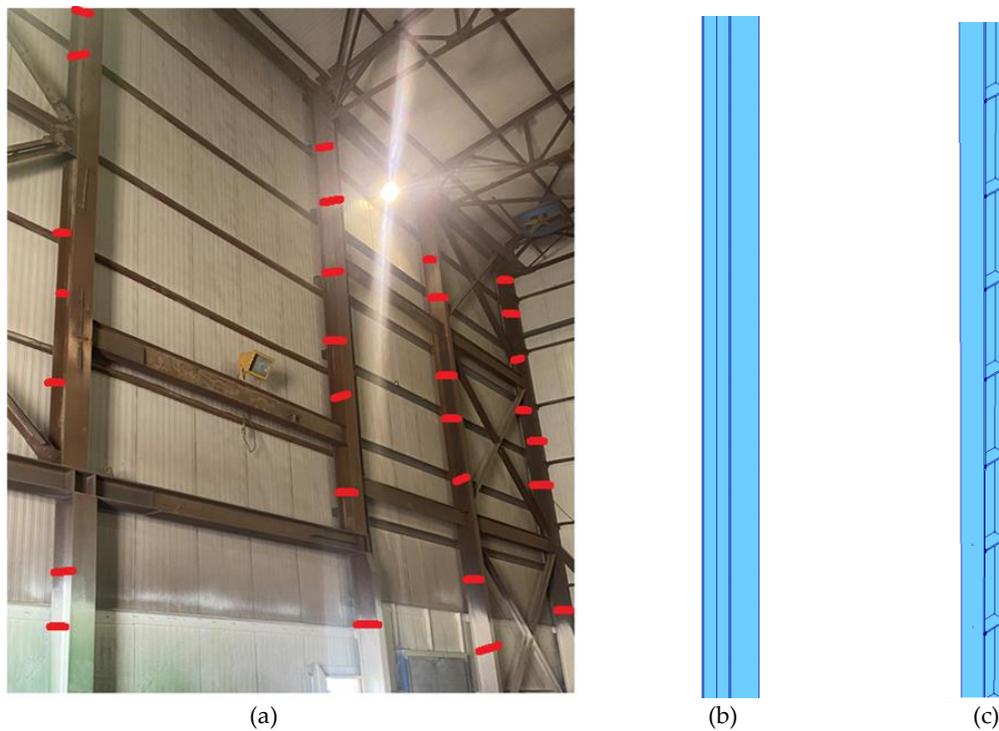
Column of industrial building: (a) actual conditions on site; (b) FE model of steel column without reinforcement; (c) FE model of steel column with reinforcement.
